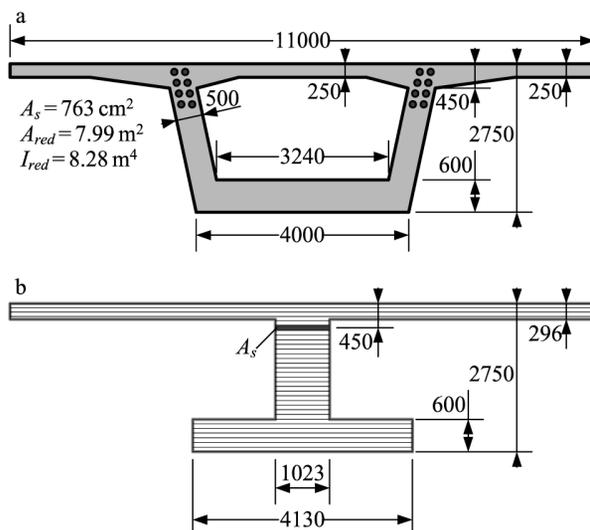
Box girder cross-section (a) and its Layer model (b)
